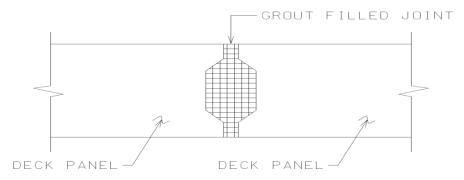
Detail sketch of a female-to-female type shear key transverse joint.
